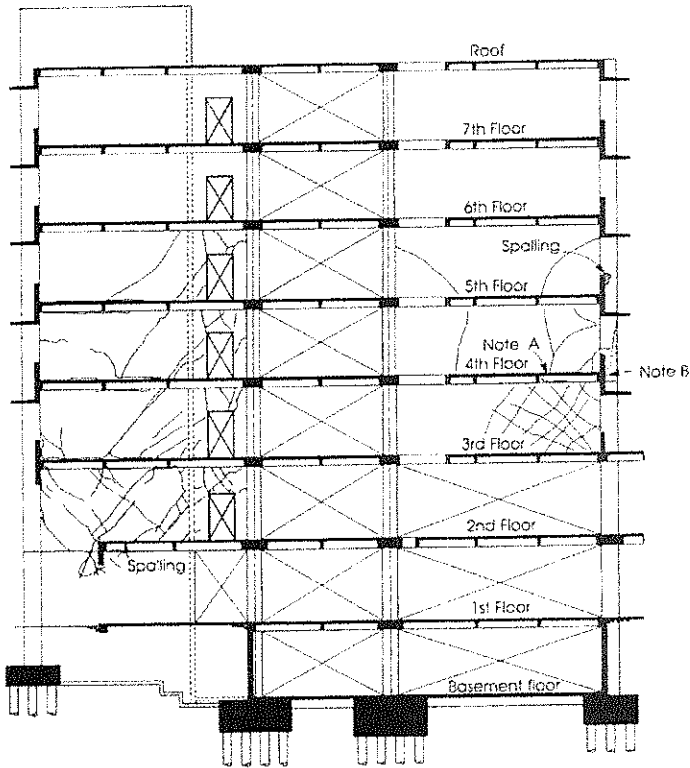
Damaged shear wall with slippage along construction joint. The ends of the wall have spalled due to overturning forces. Post Unsafe or Restricted Use.
